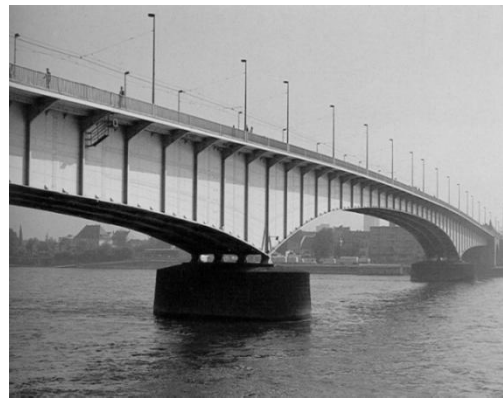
Tapered plate girders in long continuous bridge over The Rhine River, Colonia-Deuz, Germany (photo: Leonhardt, 1986)
